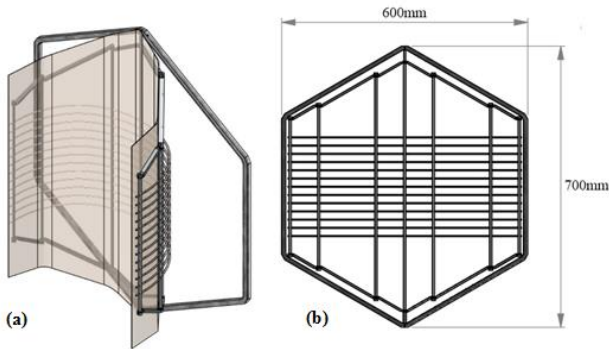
(a) axonometry showing the design of the shape-morphing module panel. (b) front view of the module panel and its dimensions.
